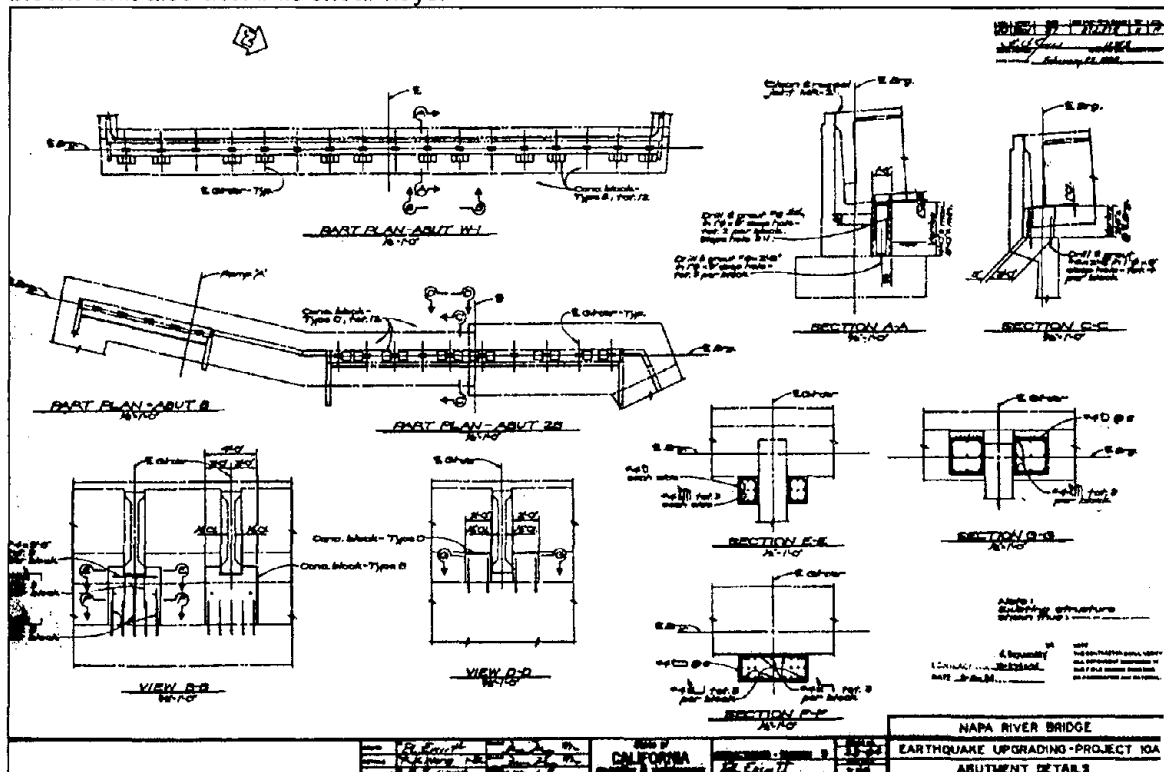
Napa River Bridge Earthquake Retrofit Details at Abutments
